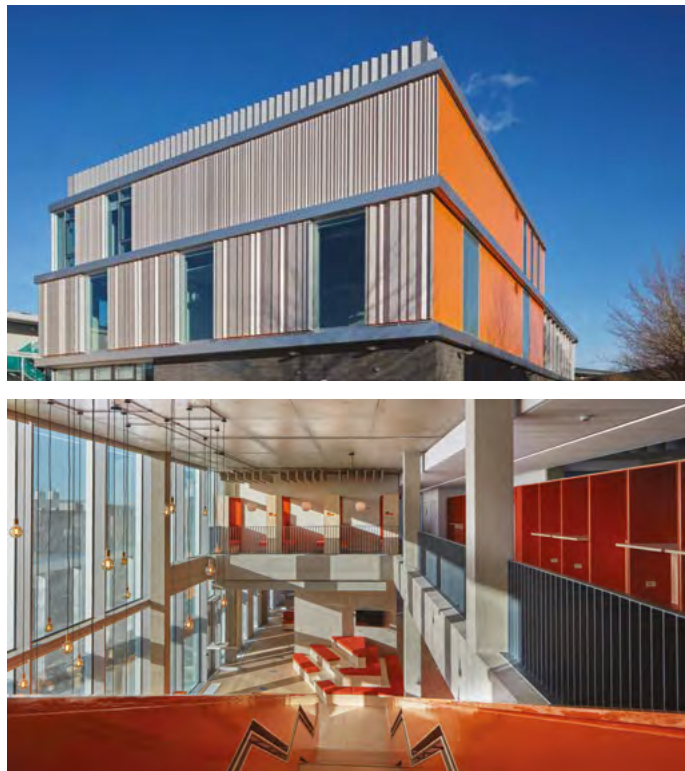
The Shared Facilities Building at Hand-over. Top: exterior view; bottom: internal view.
